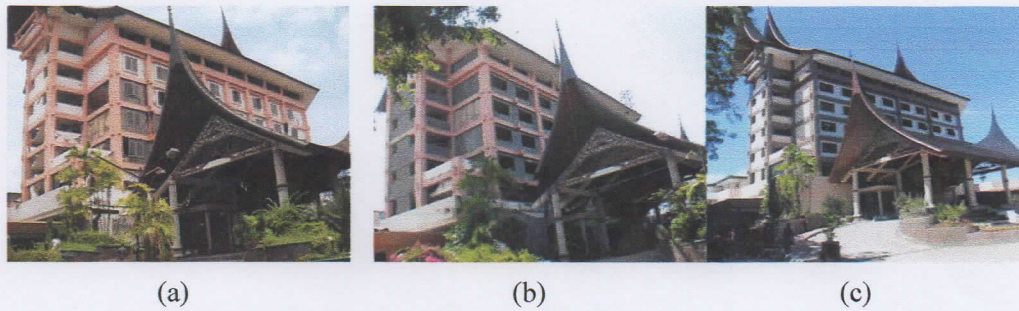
Front view - before retrofitting(a); after retrofitting (b); after repainted (c).
